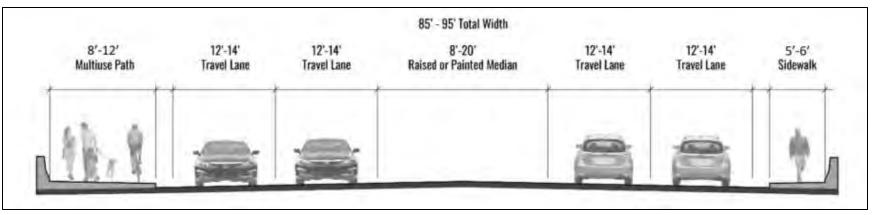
Typical roadway section for the proposed 88th Avenue bridge
